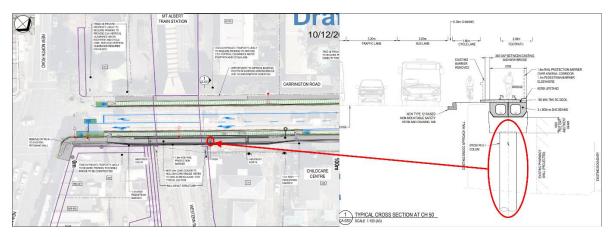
Excerpt of preliminary General Arrangement Plan CH 0 to CH100 (DWG 3230635-CA-0201 Rev A) and Typical Cross Section (DWG 3230635-CA-0401 Rev A) showing new active mode bridge over the KiwiRail NAL designation and indicative location of pier / column.
